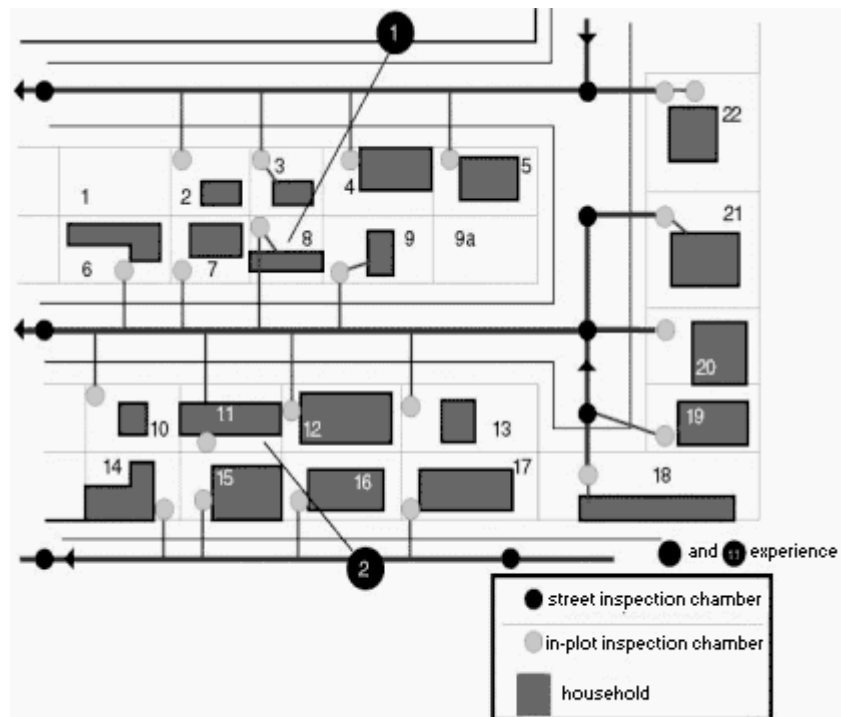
Pipe Layouts for Conventional Sewerage (UNEP)
